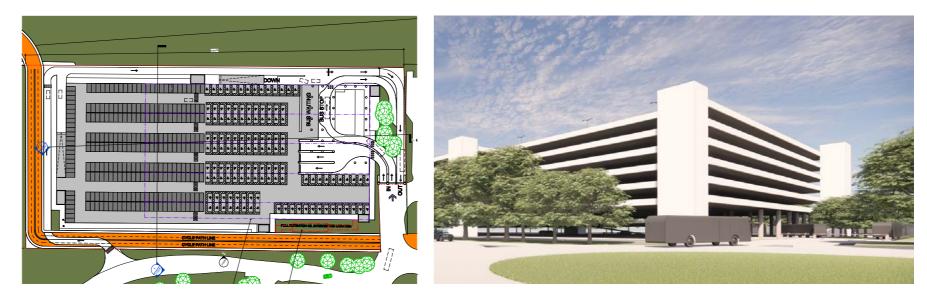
Indicative Site Plan of Multi-Storey Car Park
